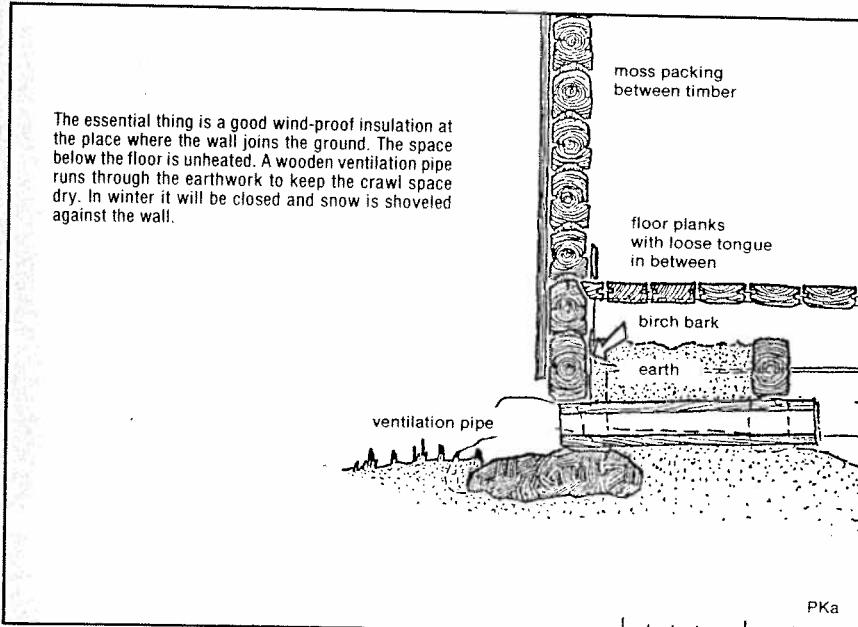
The floor construction of an 18th century house at Jakkarila manor, Porvoo.
